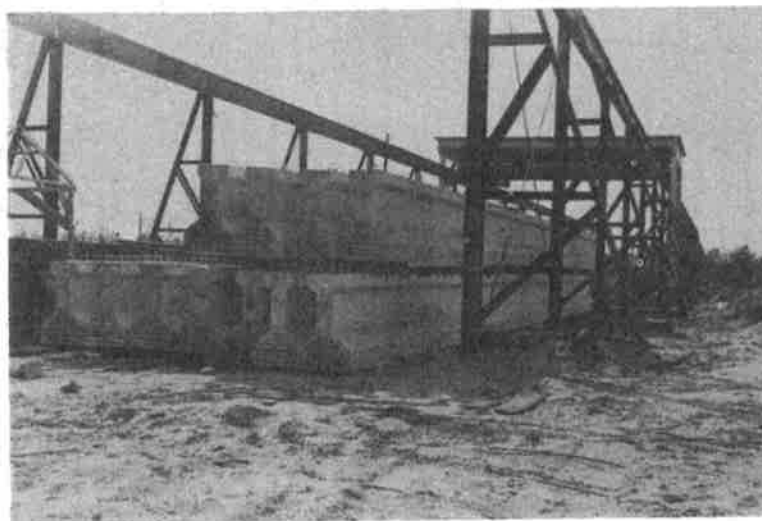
Prestressed beams stored at the casting yard, Garden State Parkway bridges, Section II.
